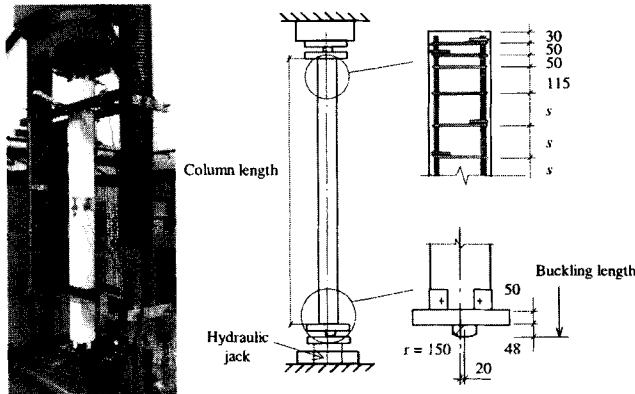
Load Arrangement for Slender Columns (Dimensions in Millimeters)
